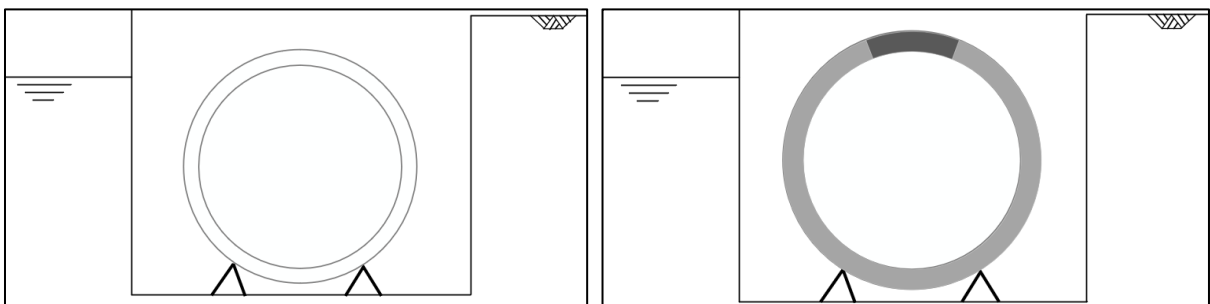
Construction sequence in case of conventional casting. First, a formwork is made, then the concrete is poured. A prefab element is placed on top.
